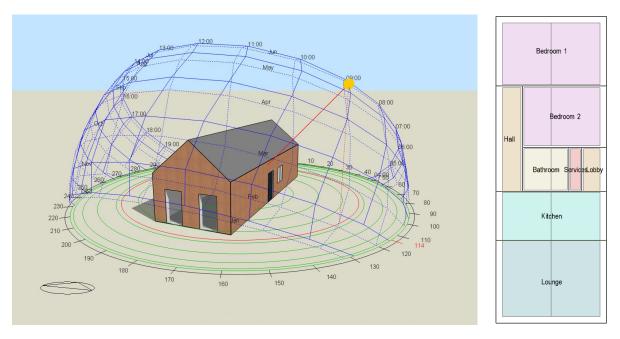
Model geometry and floor plans for Wikihouse Skylark two-bedroom detached bungalow
